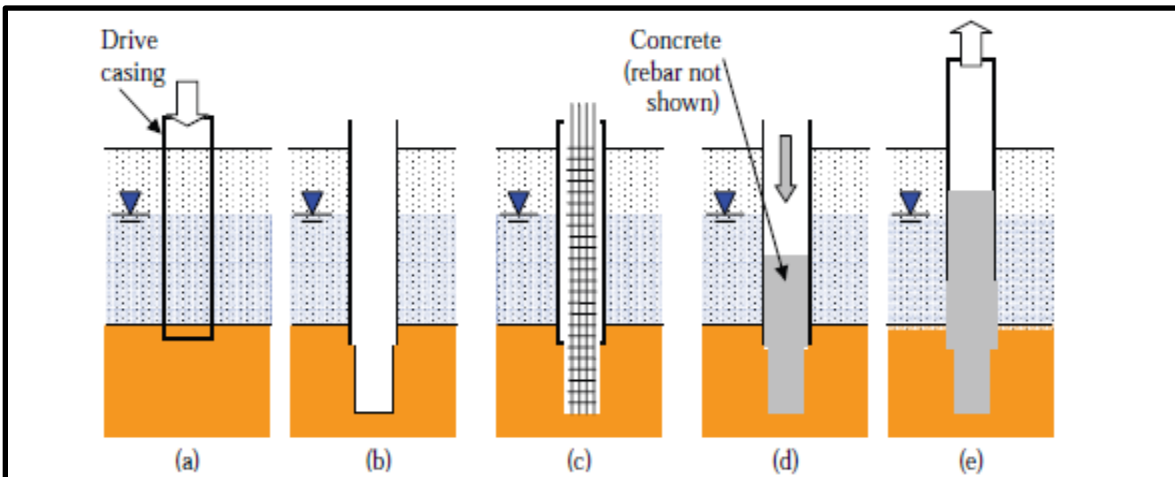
Construction Using Casing Advanced Ahead of Excavation: (a) drive casing into bearing stratum; (b) drill through casing; (c) complete and clean hole, set reinforcing; (d) place concrete to head greater than external water pressure; (e) pull casing while adding concrete
